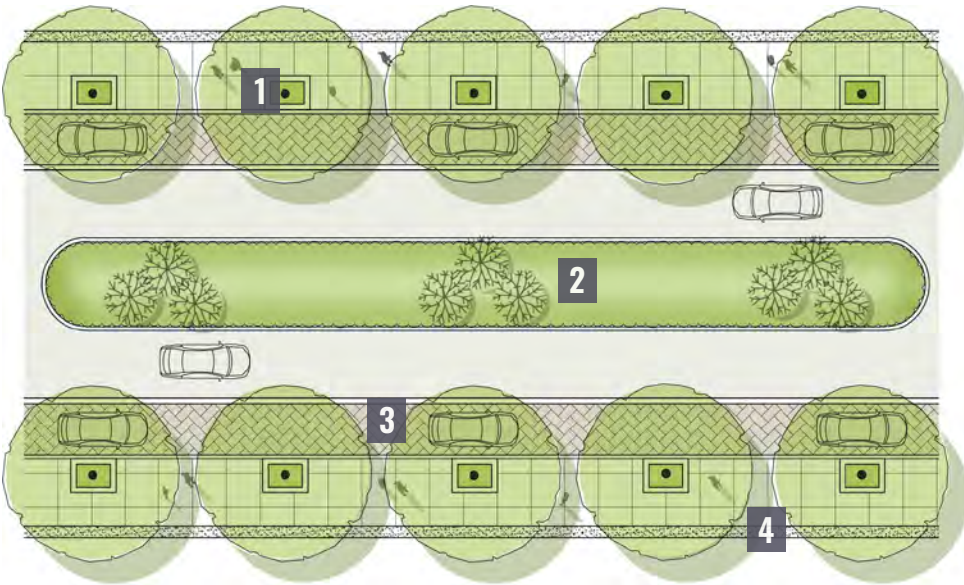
PLAN VIEW OF TYPICAL GREEN STREET RETROFITS IN A MEDIUM-DENSITY RESIDENTIAL STREET
